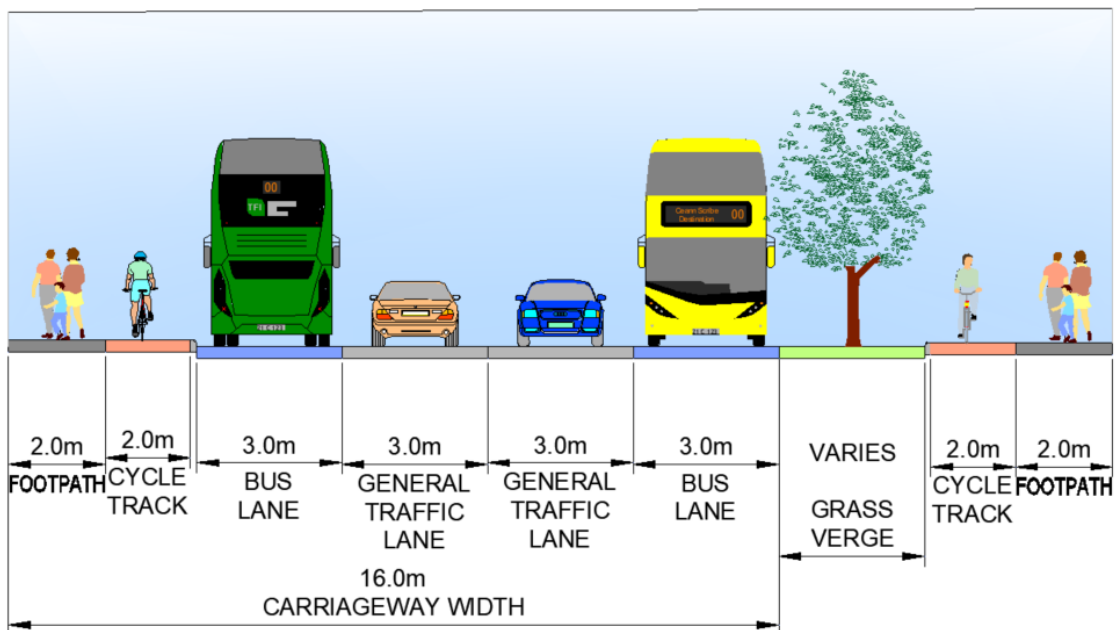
Section 2 Option 3 Indicative Cross Section
